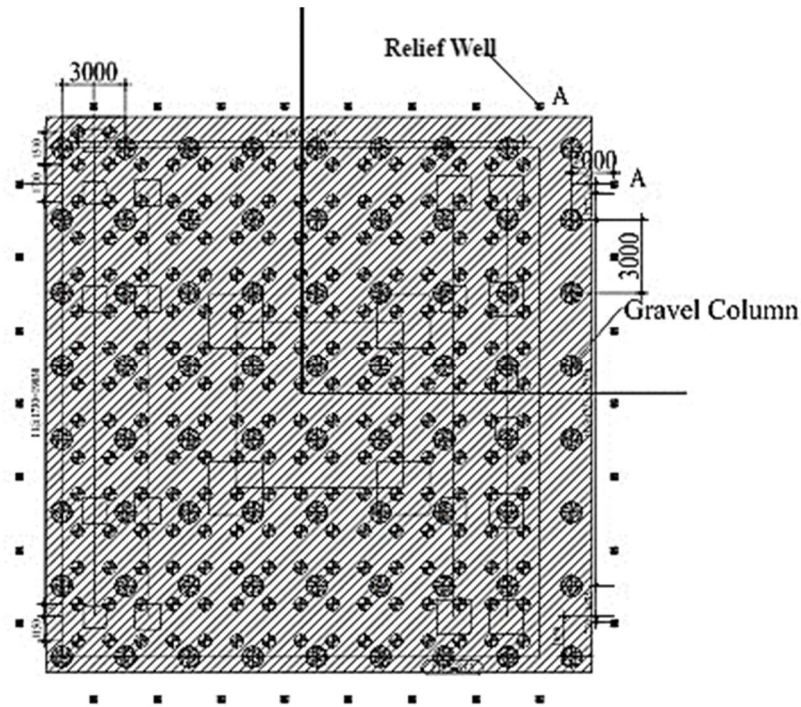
RX-RG Tower gravel column layout in Cilacap [18].
